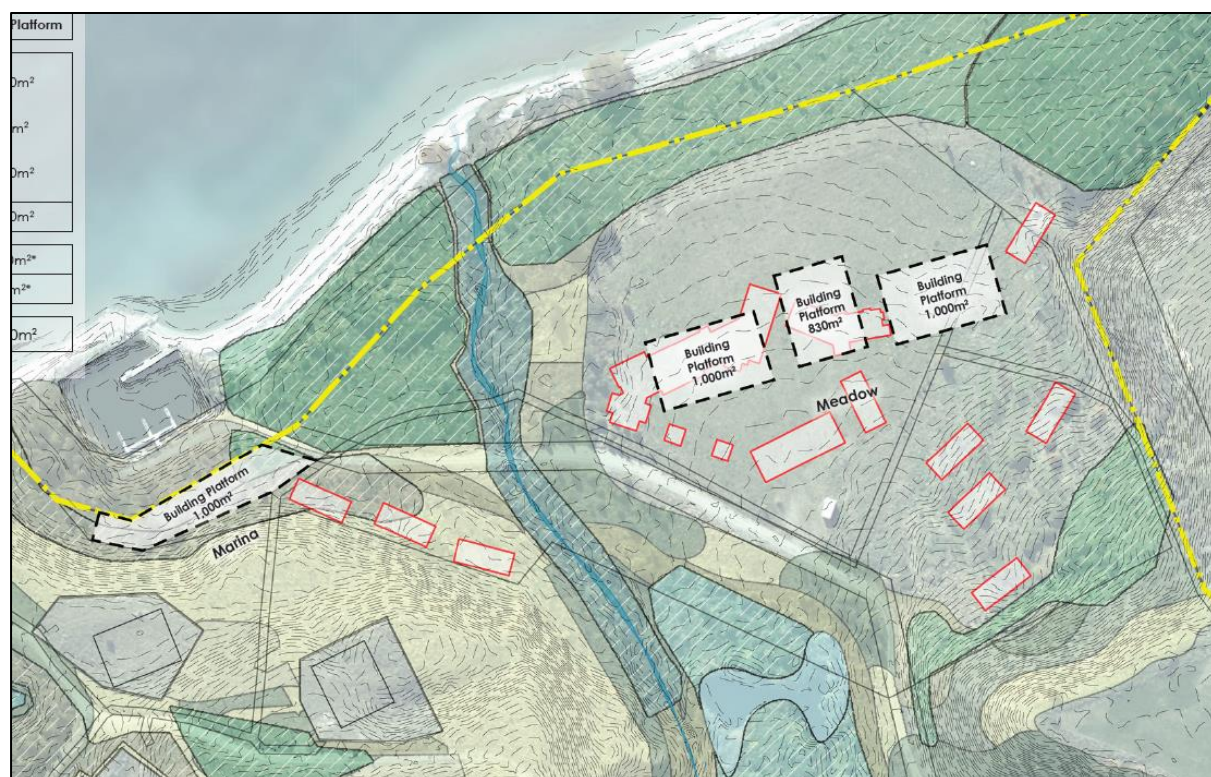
Location of existing approved building areas (outlined in red) and replacement building platforms (outlined in black dash). Image Source: Patch Landscape Site Plan.
